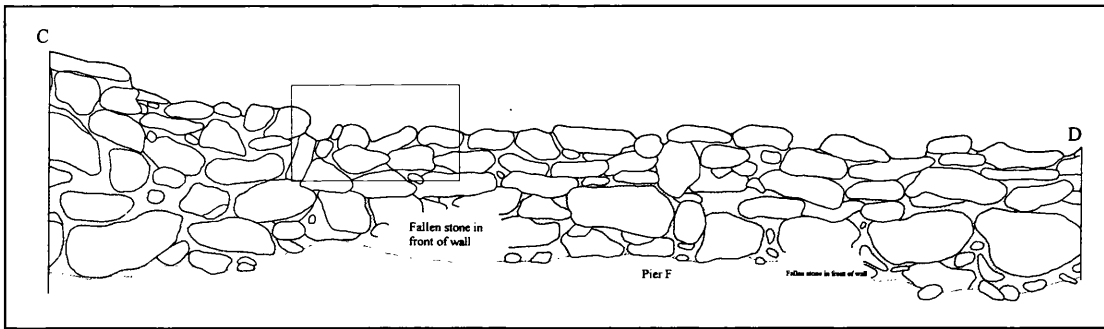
Elevation of walling between piers G and F with area of modification indicated in red.
